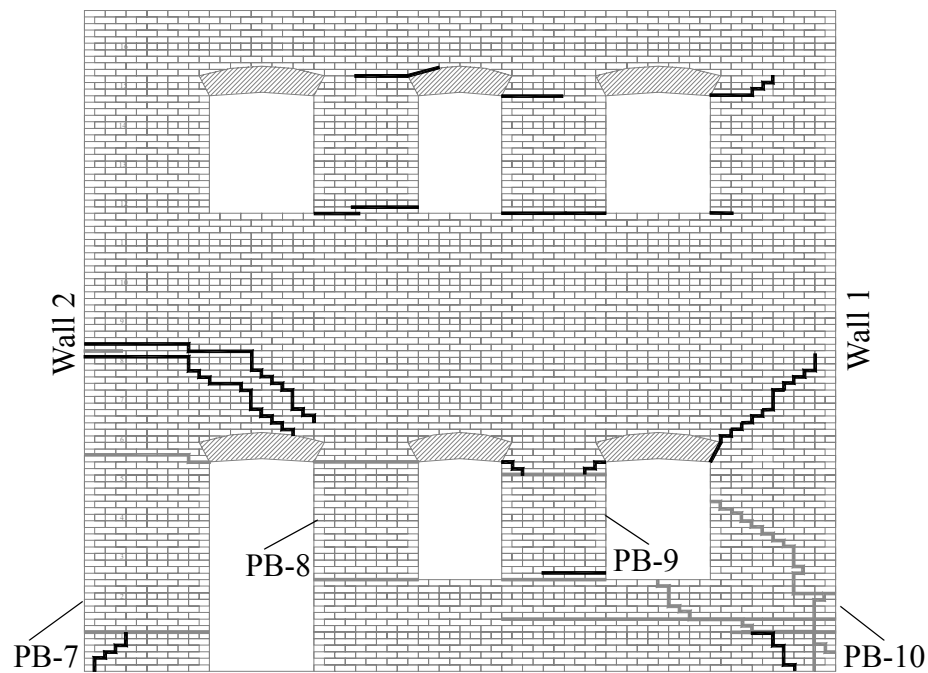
Crack pattern of Wall B following Test Run 26.
